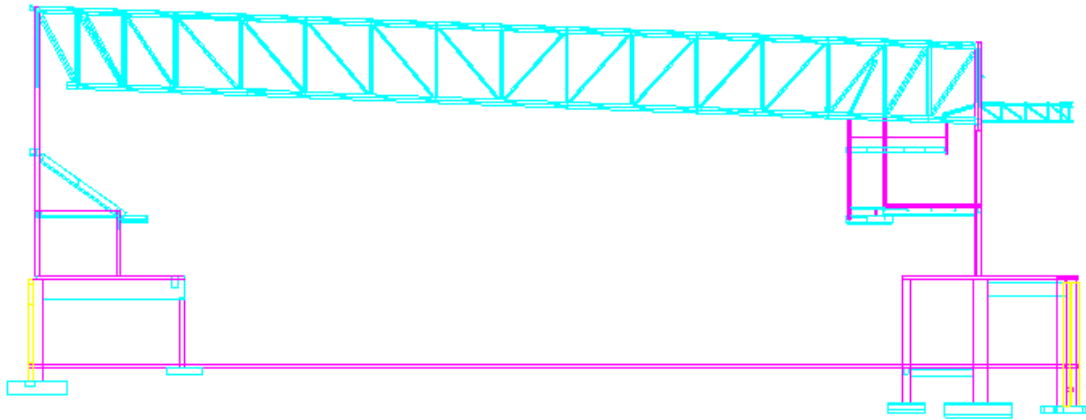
Section of Truss Bay Structure, courtesy of Faisant
